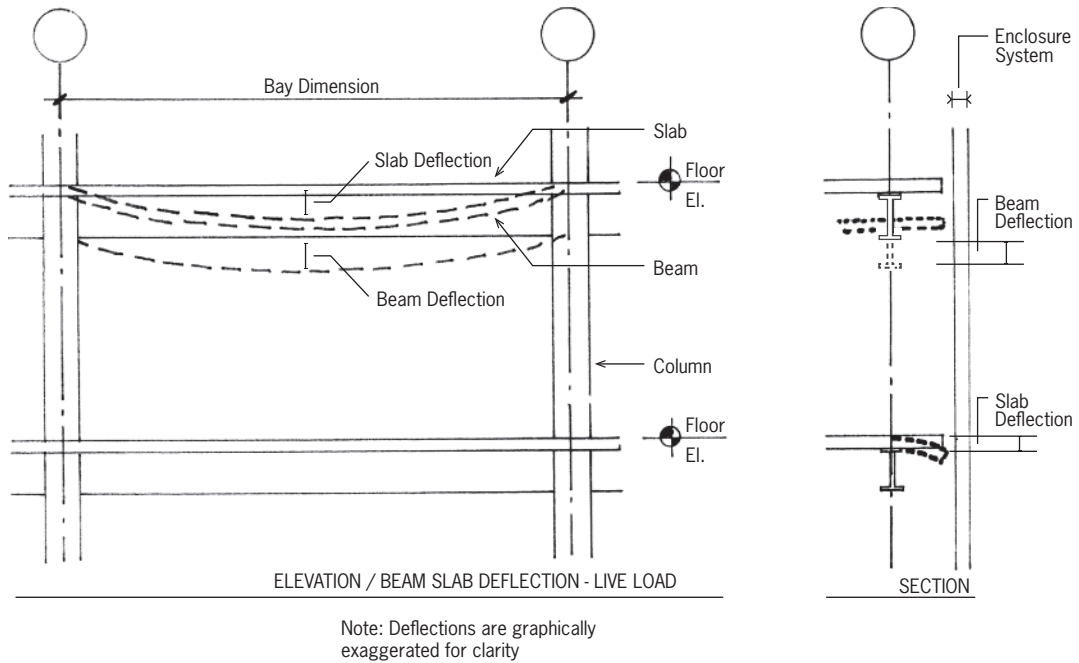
Primary building structural elements react to loads imposed. Imposed loads include dead loads and live loads that create structural deflections that must be addressed in the enclosure design. Note both deflections shown in elevation and section can occur simultaneously.
